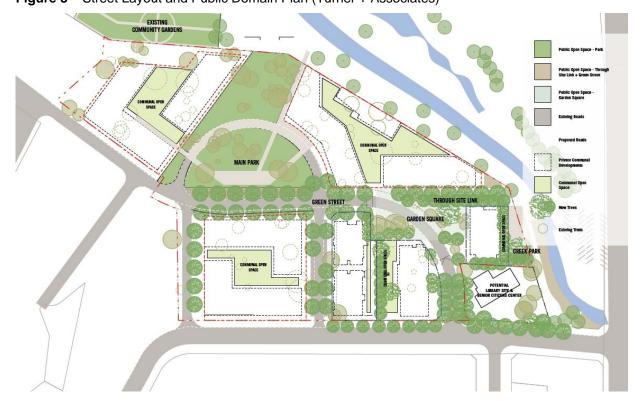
Street Layout and Public Domain Plan (Turner + Associates)
